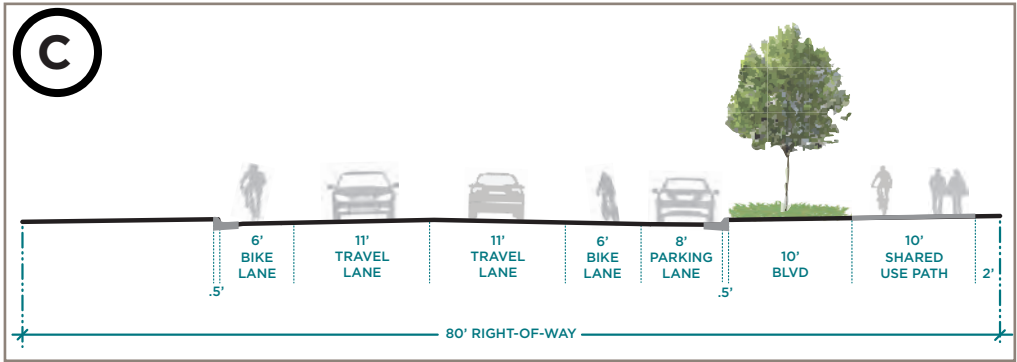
Preferred Alternative East Broadway Segment 'C' Typical Section Looking East
